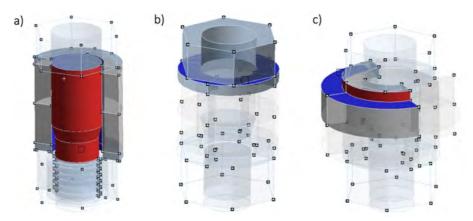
Contacts: a) radial contact: bolt – end-plate b) anti-slip contact: bolt – washer; c) contact between end plate and external surface of washer
